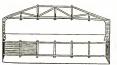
Truss-girder bridge designed by Palladio. 1570.
